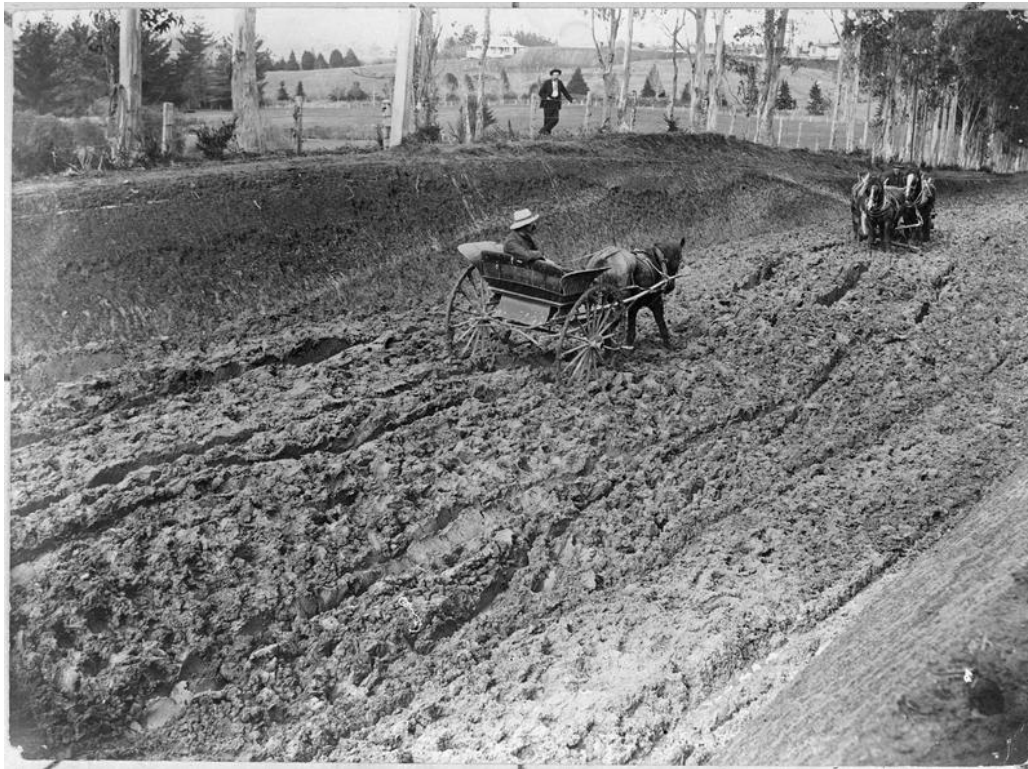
Traffic in Mud after new road formed<sup>29</sup>
